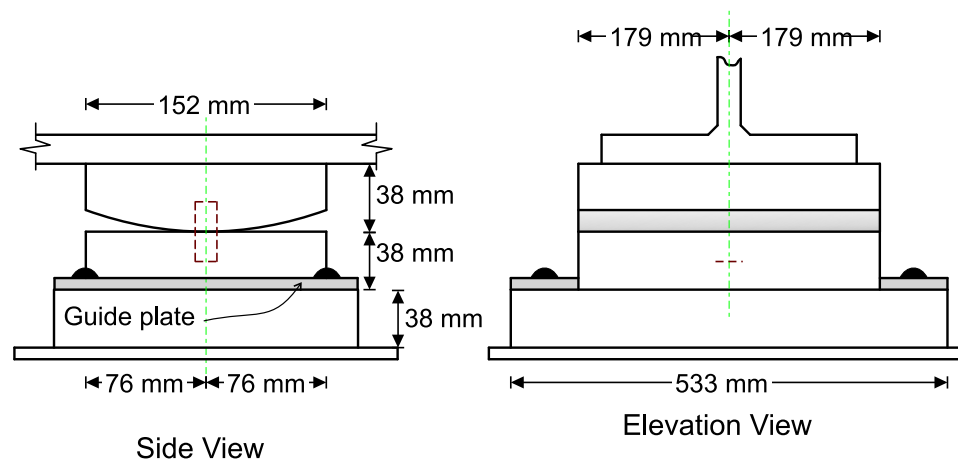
Dimensions of Low-Type Expansion Bearing.
